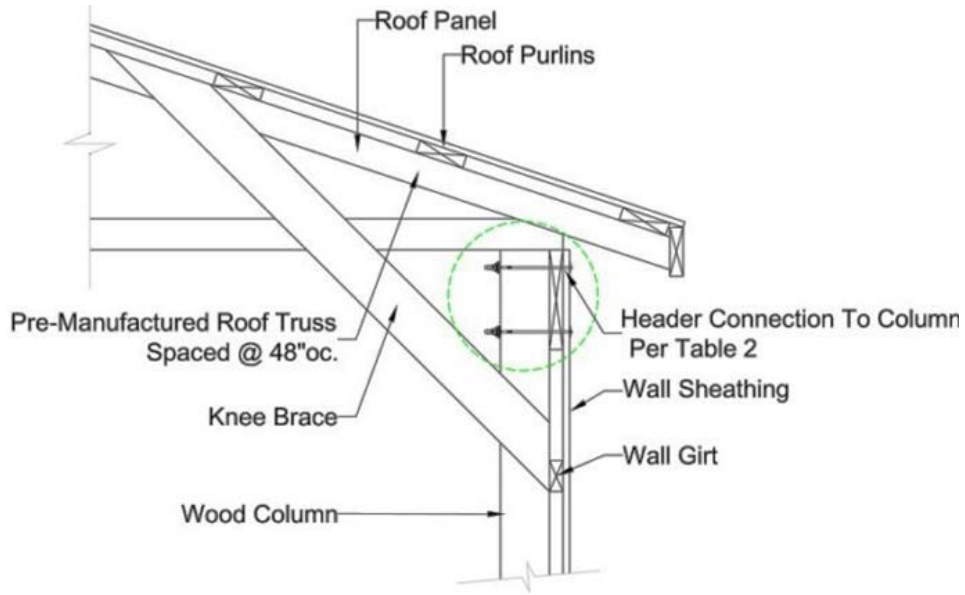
THRULOK™ SCREW BOLT FASTENING SYSTEM – ROOF TO HEADER DETAIL
